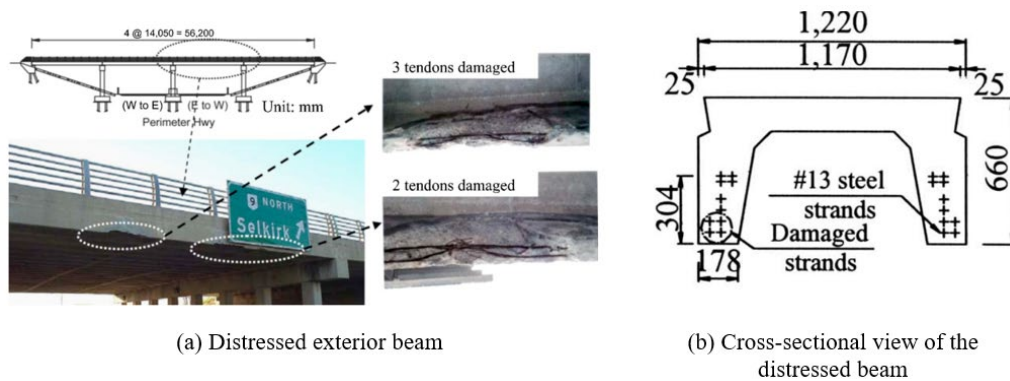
Detail of the distressed exterior beam in the Main Street Bridge in Winnipeg, Canada (Kim 2008) (Note: Dimensions are in mm)
